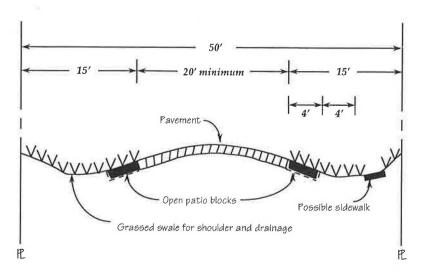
Cross section of grassy swale roadside improvement (not to scale).
